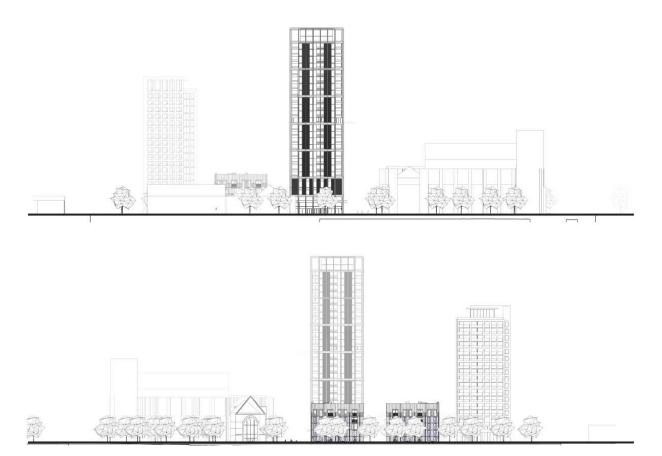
North and South Building Elevations of the proposed Cathedral Precinct development.
